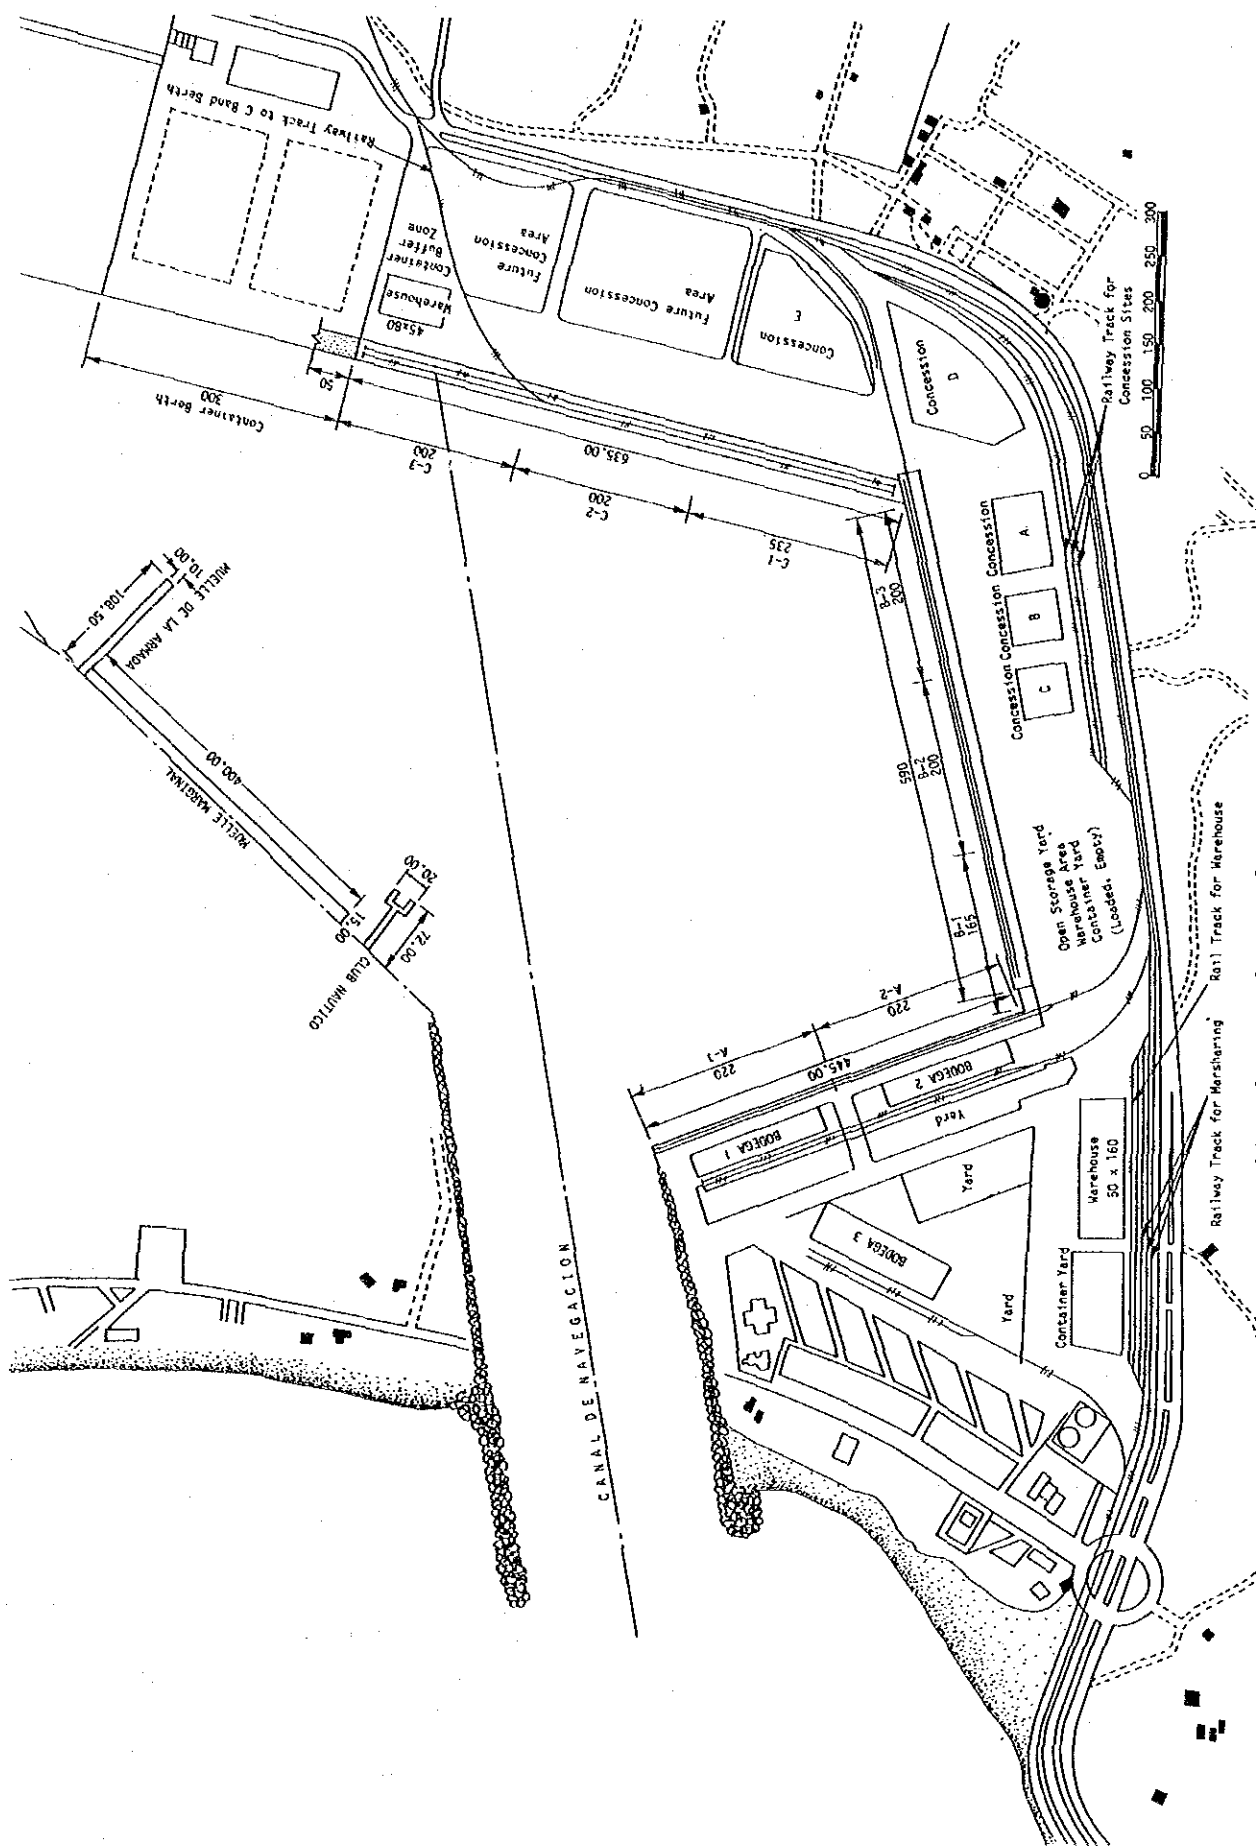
Wharf Use Plan of Inner Port Area
